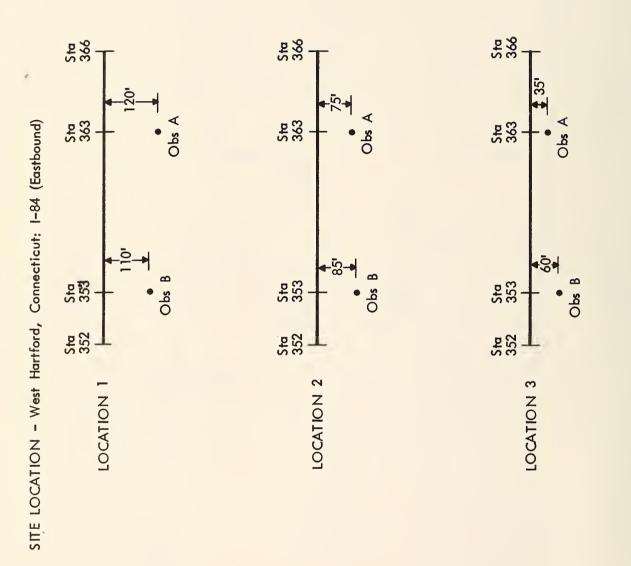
EXAMPLE 3 - BARRIER SITE PLANS
